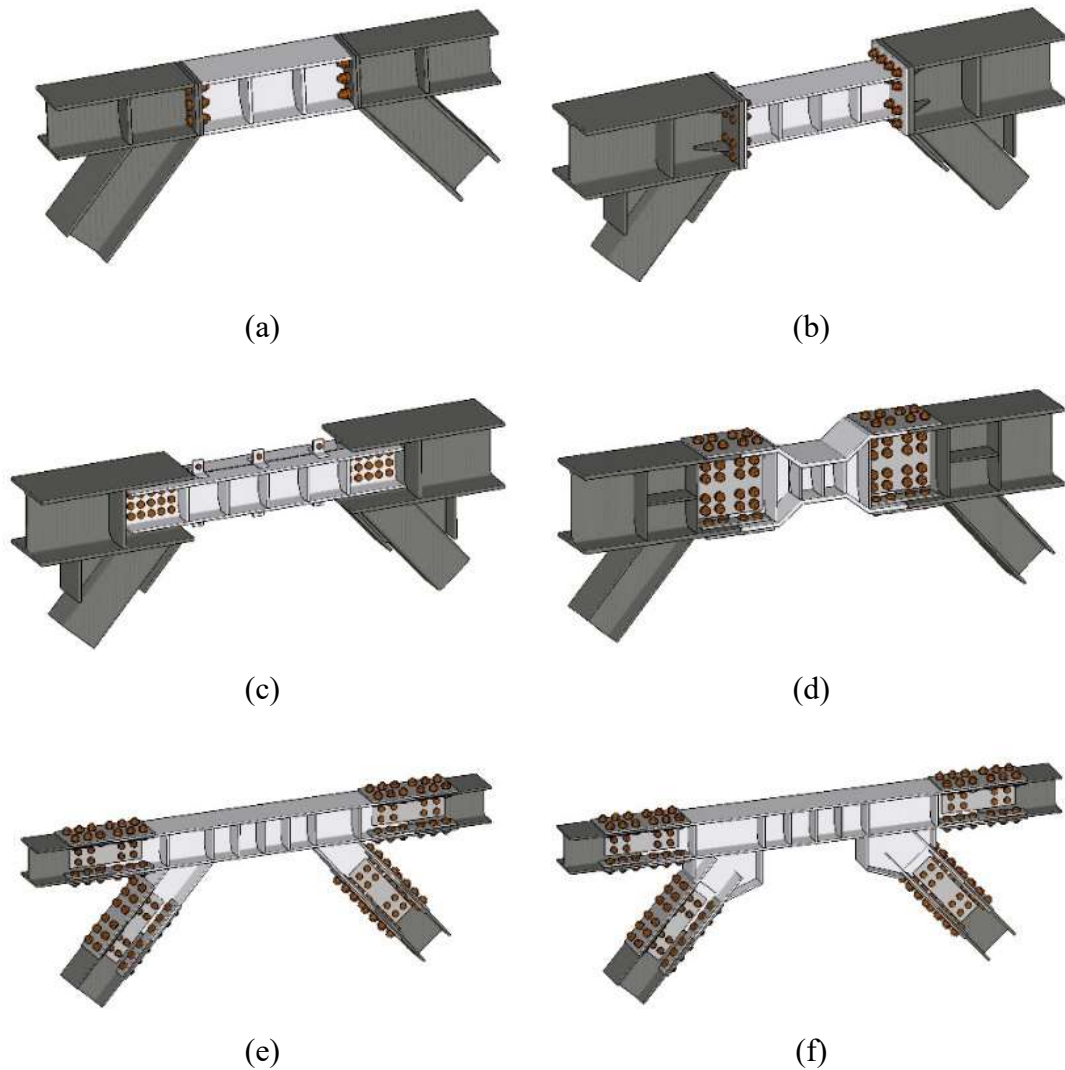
(a) bolted flush end-plated, (b) bolted extended end-plated, (c) web connected, (d) bolted flange and web, (e) direct brace attachment, (f) gusset brace attachment replaceable link
